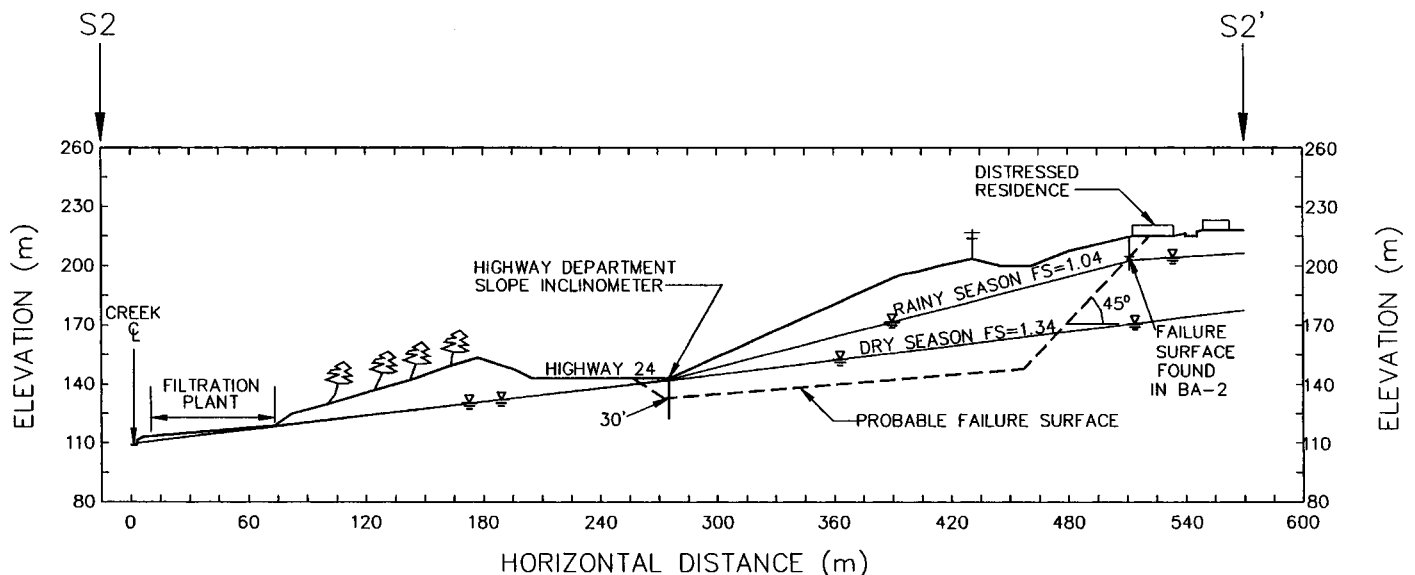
Postexcavation stability analysis for cross section S2-S2'
